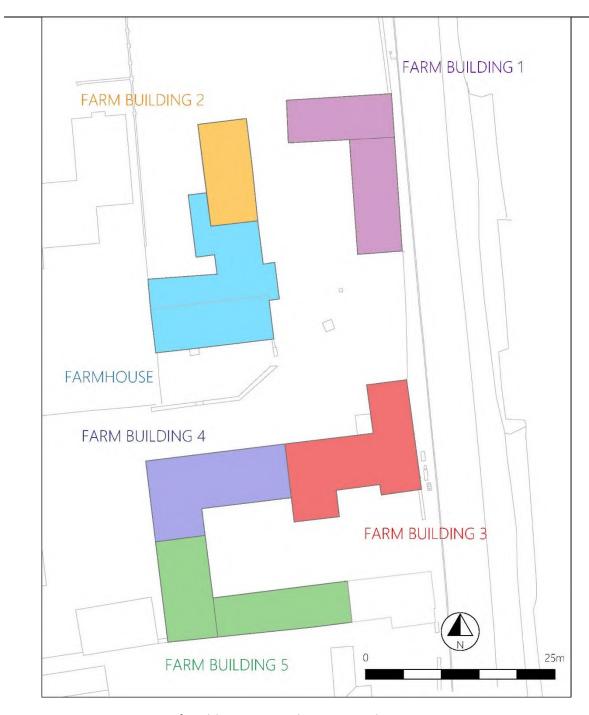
Location of Buildings at North Farm. Scale 1:500.
